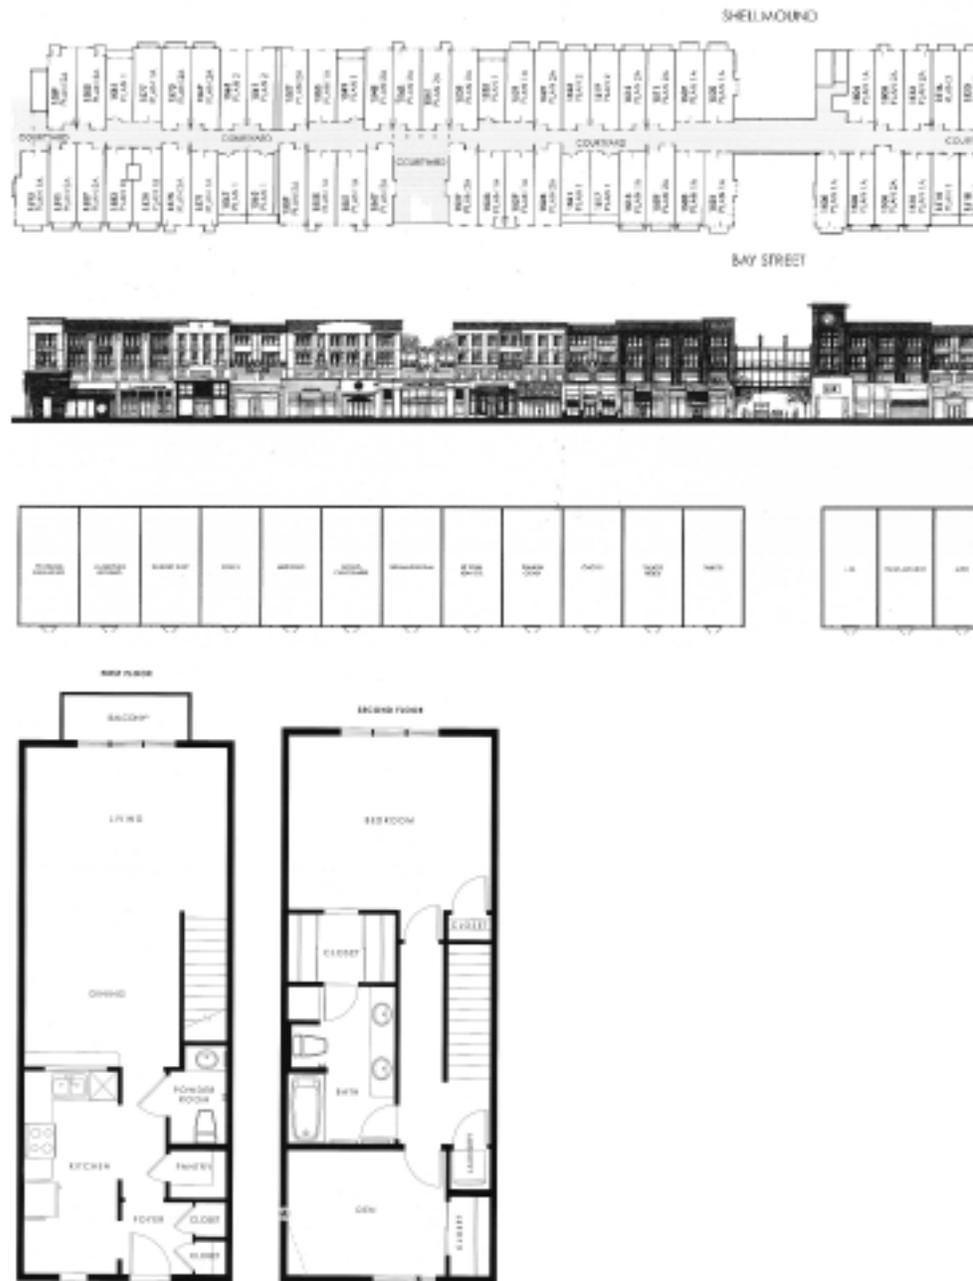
Mixing uses along Bay Street. A parking garage is sandwiched between two-level townhouses (plan top) and ground floor retail (plan bottom). The continuous building has elevations that imply differently. Source: Bay Street One, Emeryville, California.
